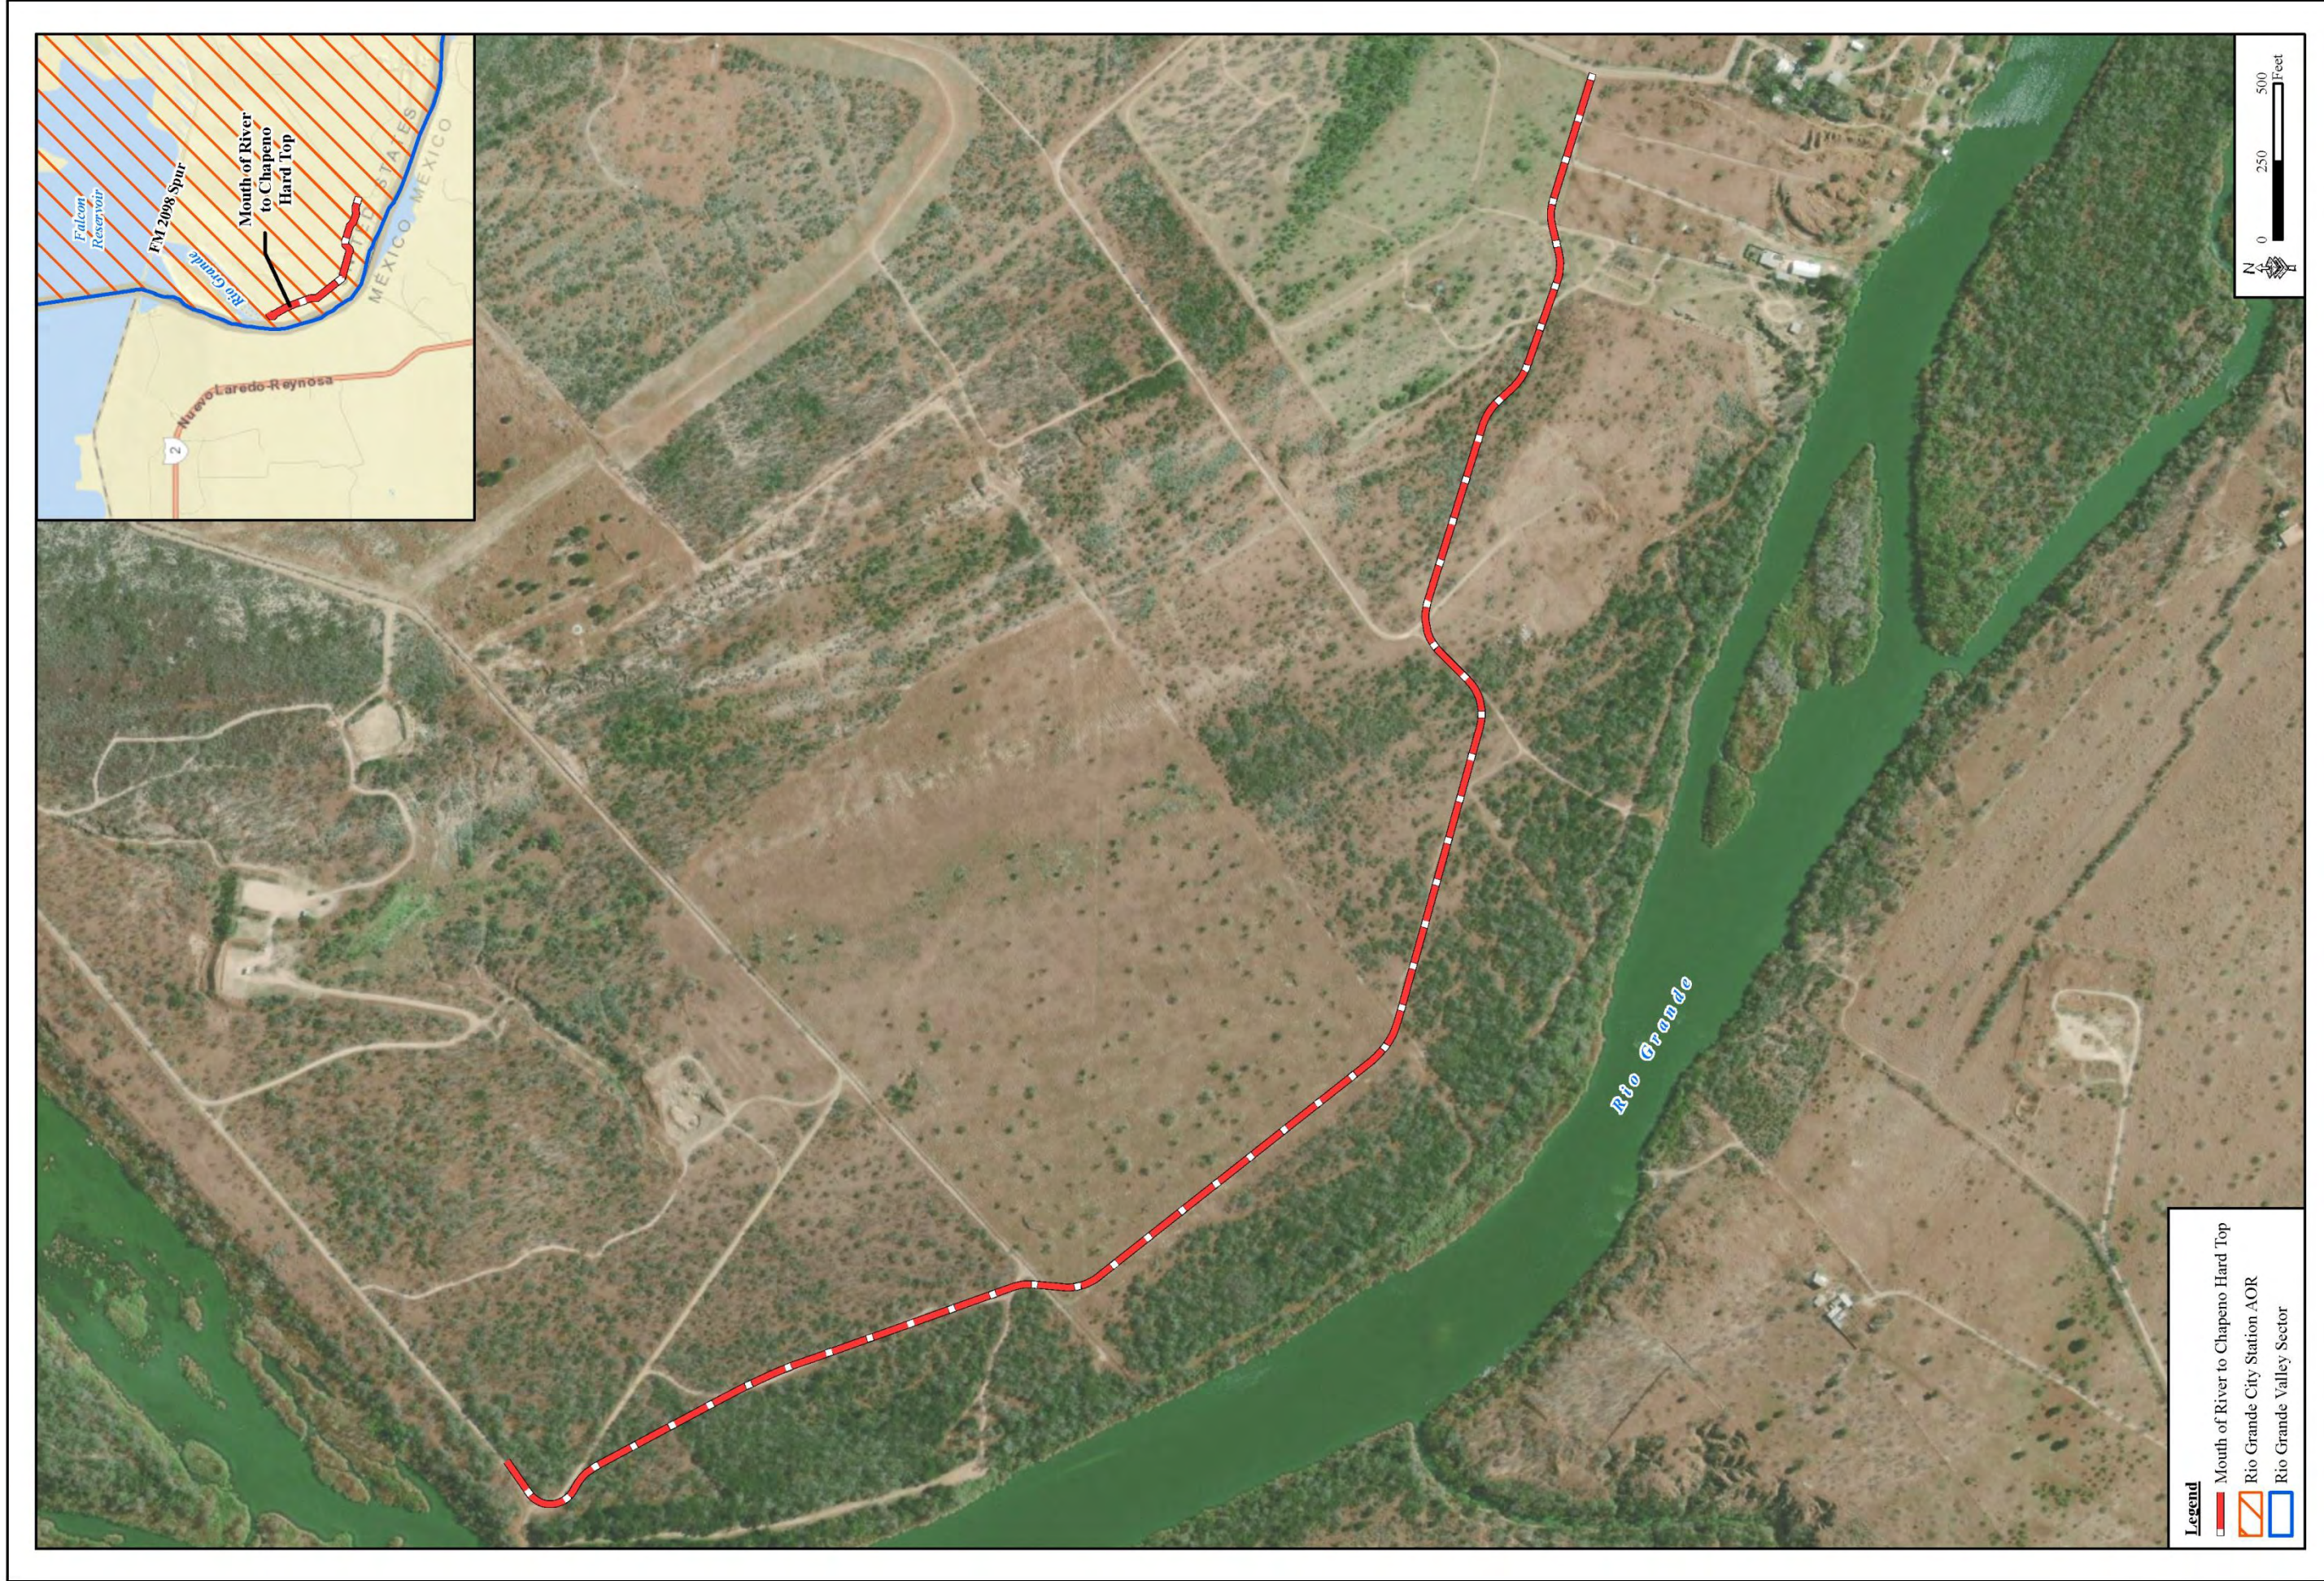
Proposed Road Alignment - Mouth of River to Chapeno Hard Top
